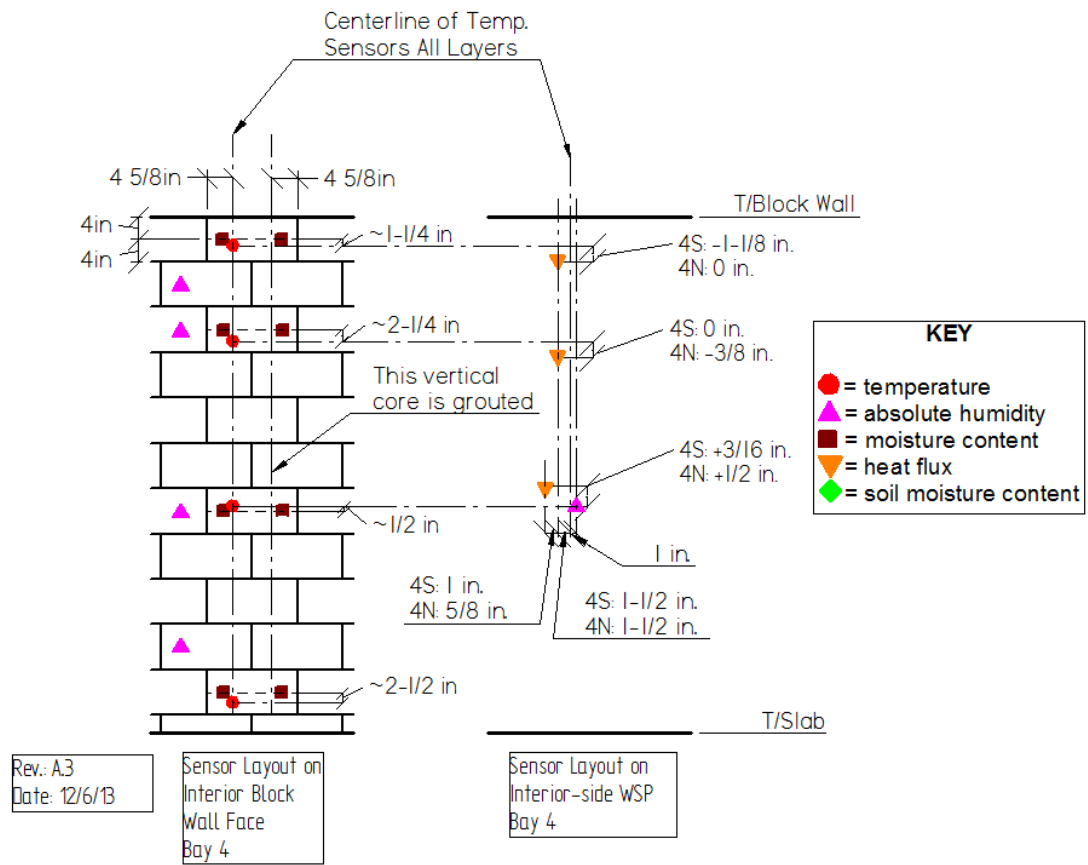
Bay 4 Wall System and Instrumentation Layout
